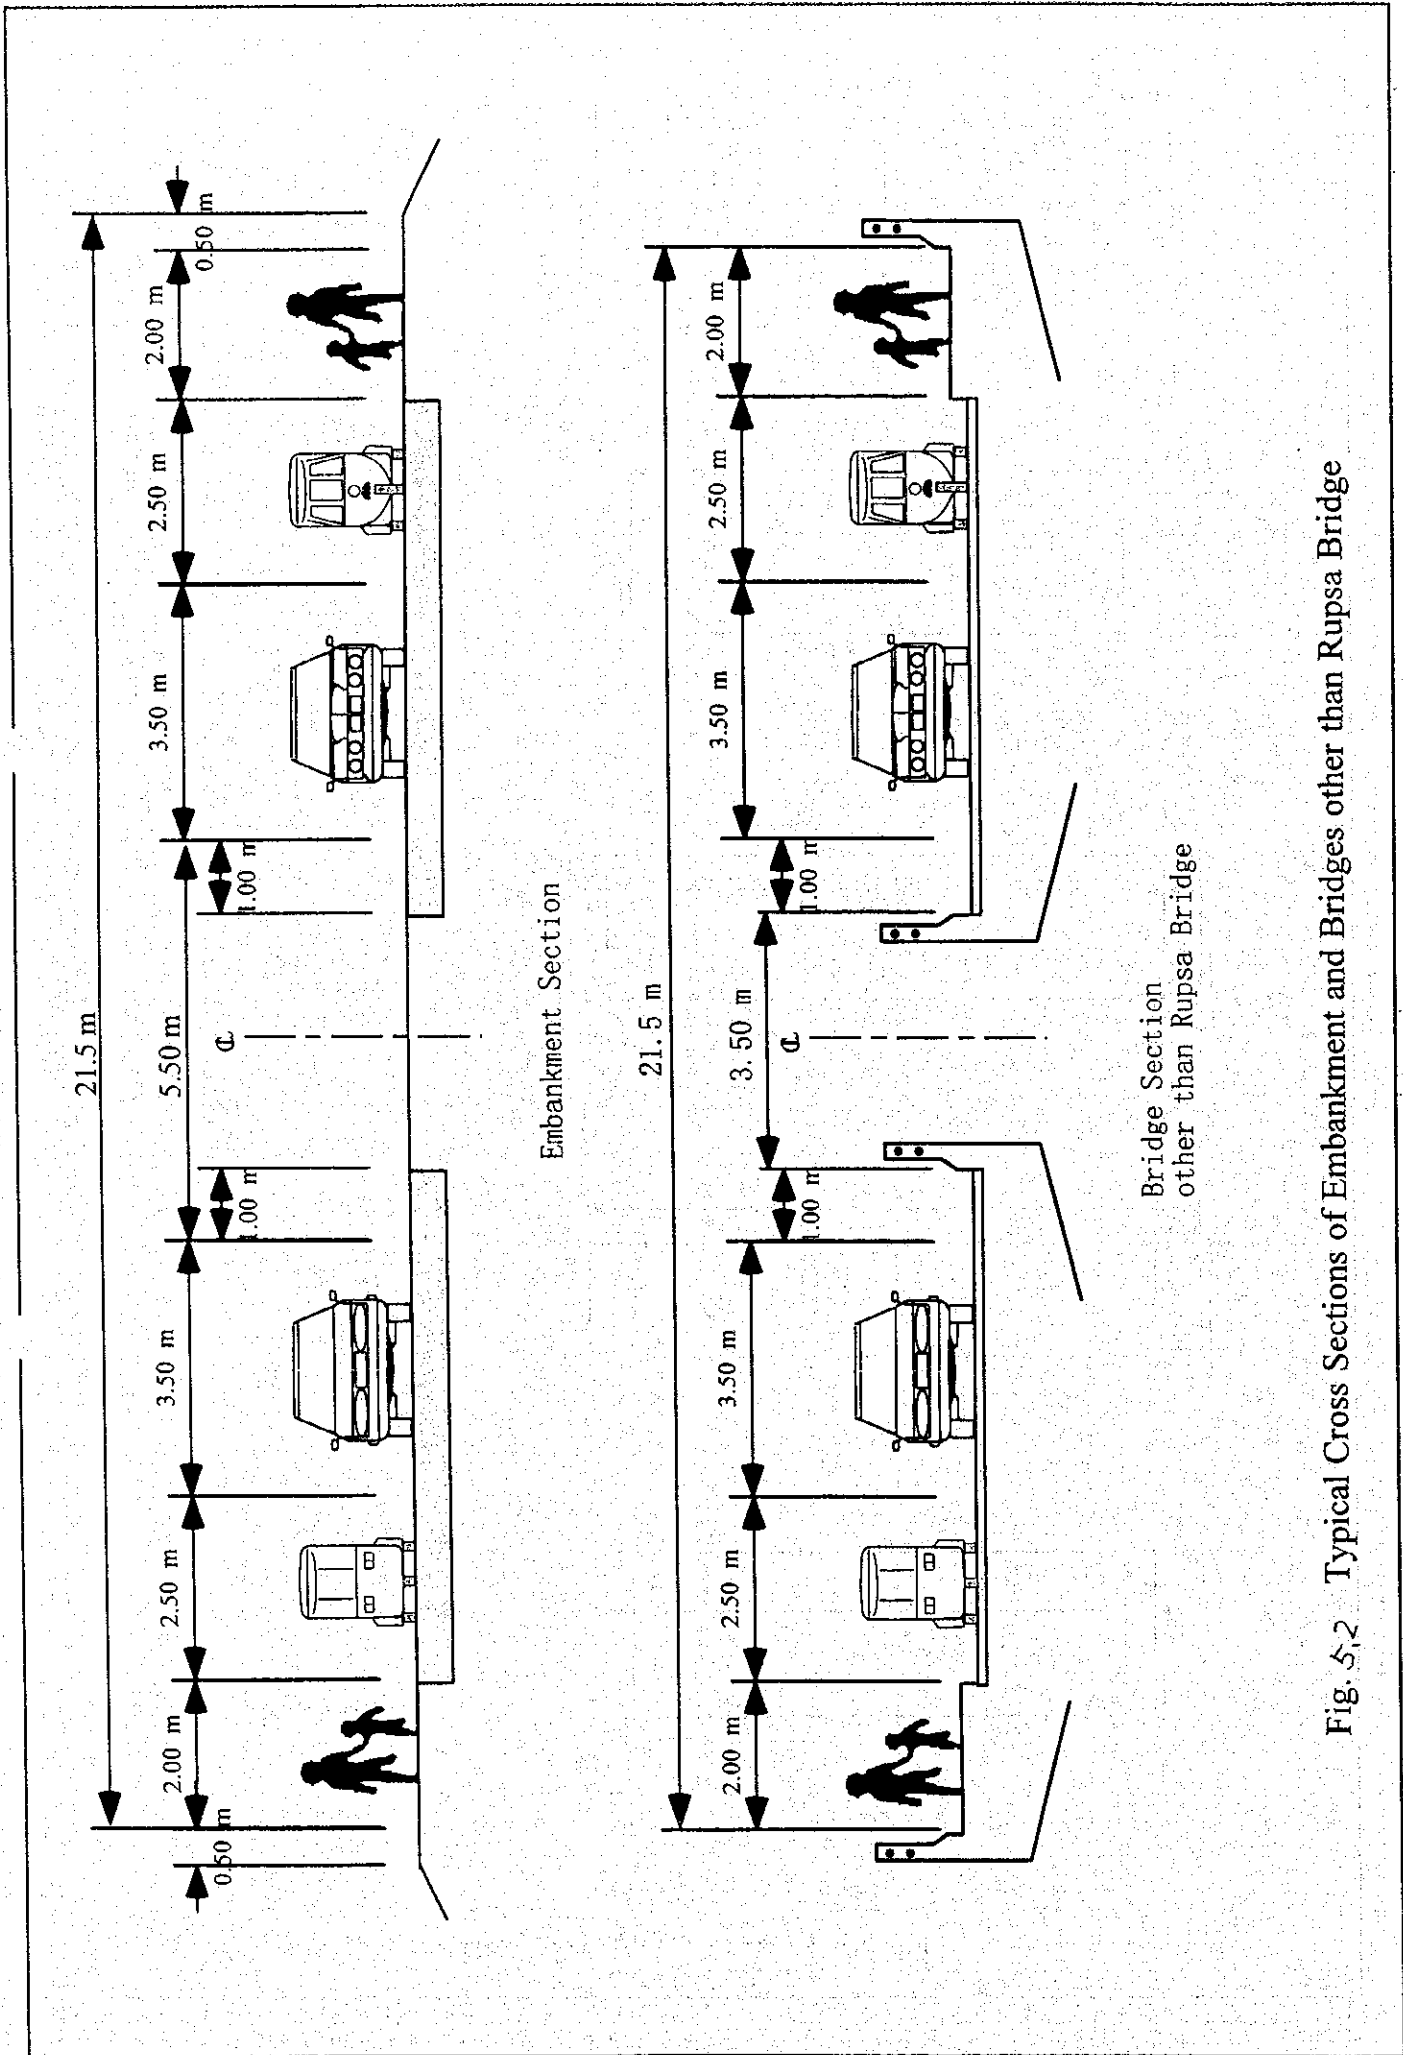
Typical Cross Sections of Embankment and Bridges other than Rupsa Bridge
